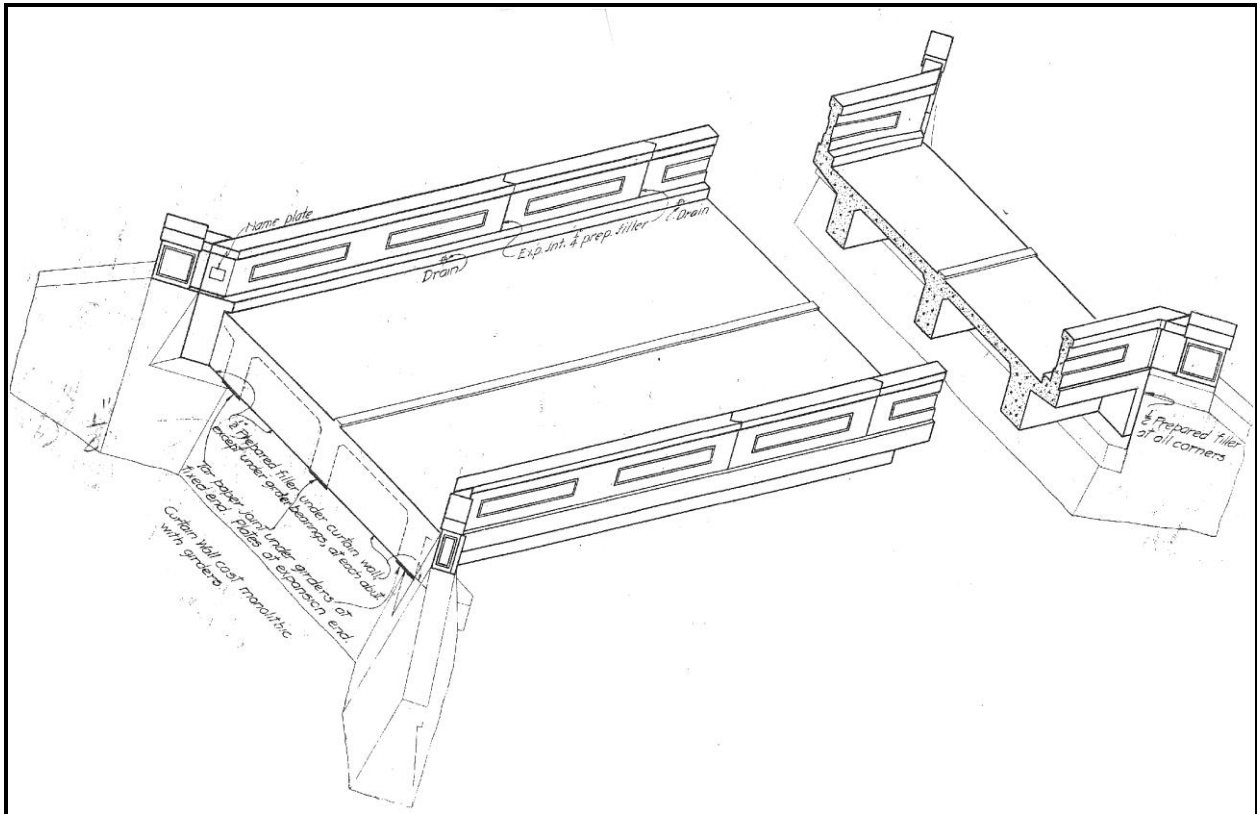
Isometric and cross-section of a concrete deck girder bridge according to 1923 State Road Commission plans
